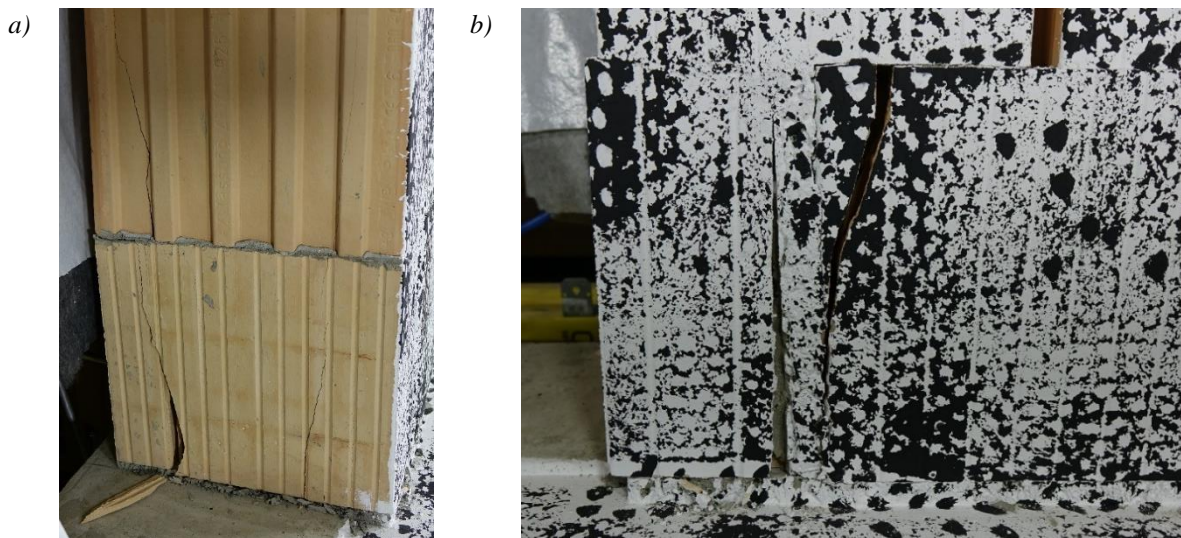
Cracks in the lowermost row of bricks ($\Delta = 0.5\%$): side view (a) and front view (b)
